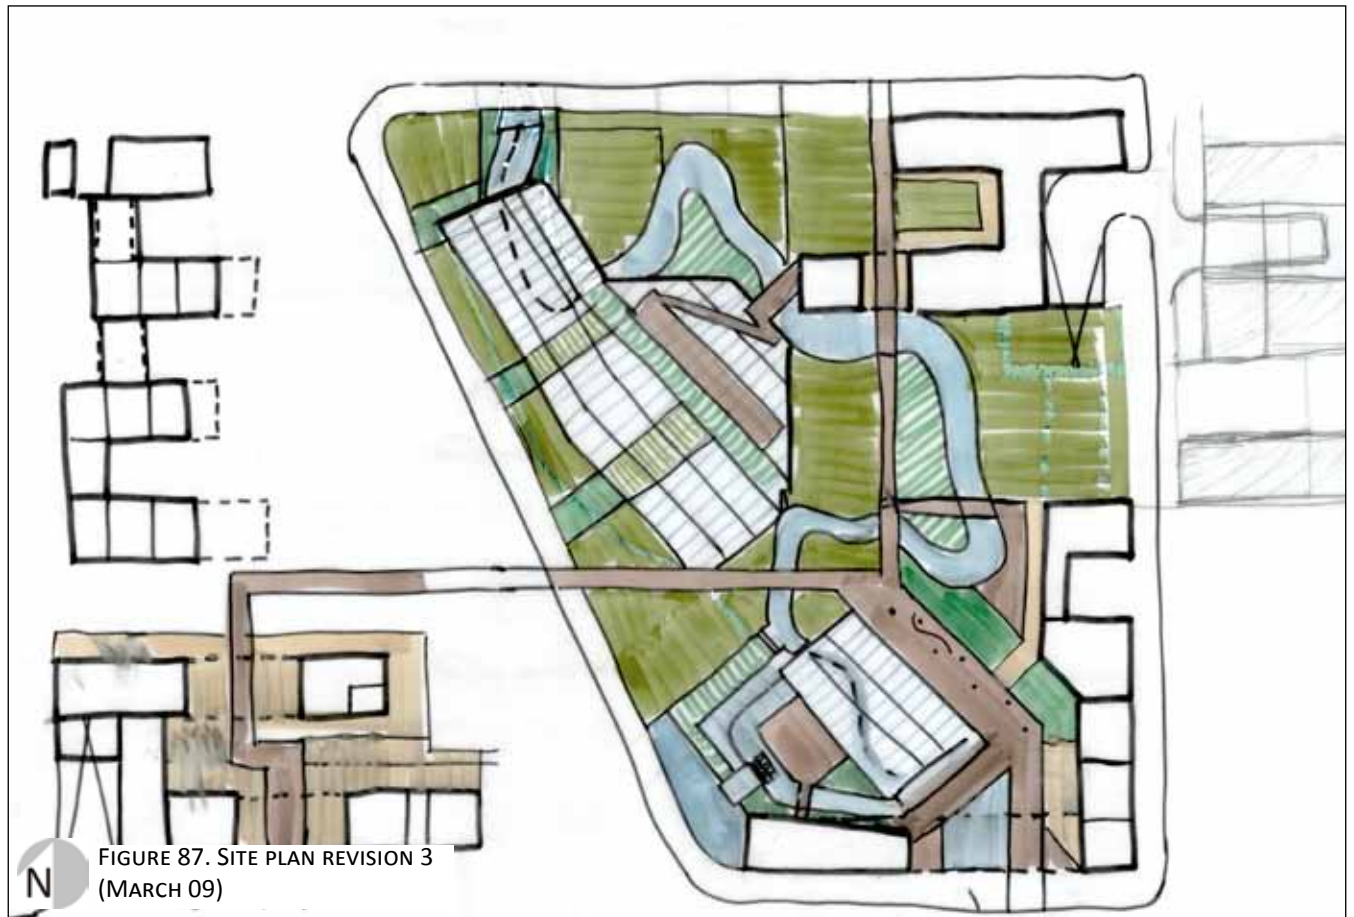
SITE PLAN REVISION 3 (MARCH 09)
